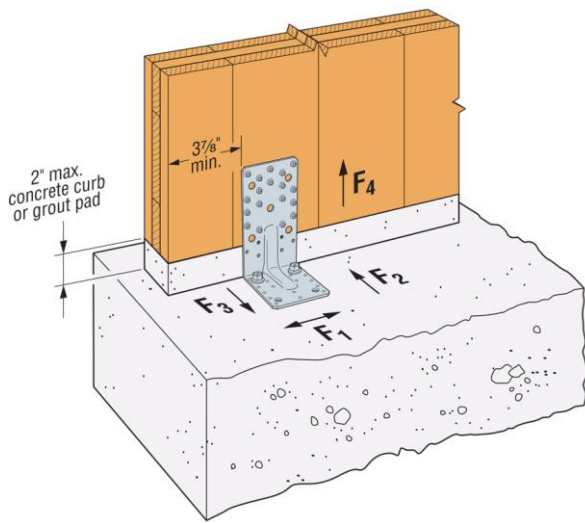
E20/3 – CLT to Concrete on Curb or Grout Pad
